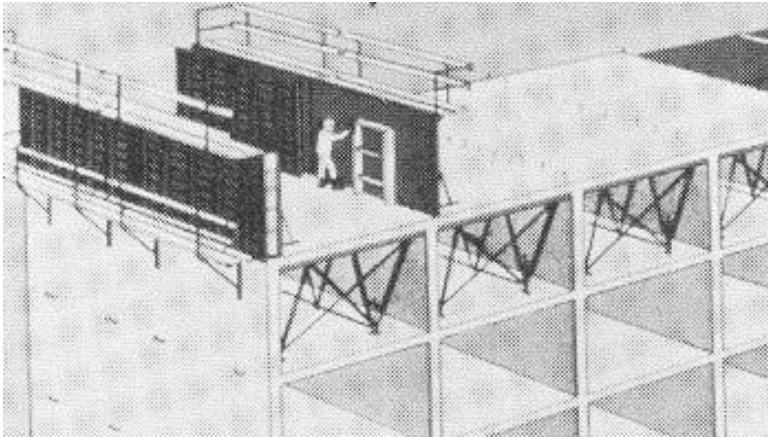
Commonly used type of cast in-situ concrete structural frame where the partition walls, supporting the slab, form a solid cell system, which reduces the future flexibility. Figure according to Nilsson (1992).
